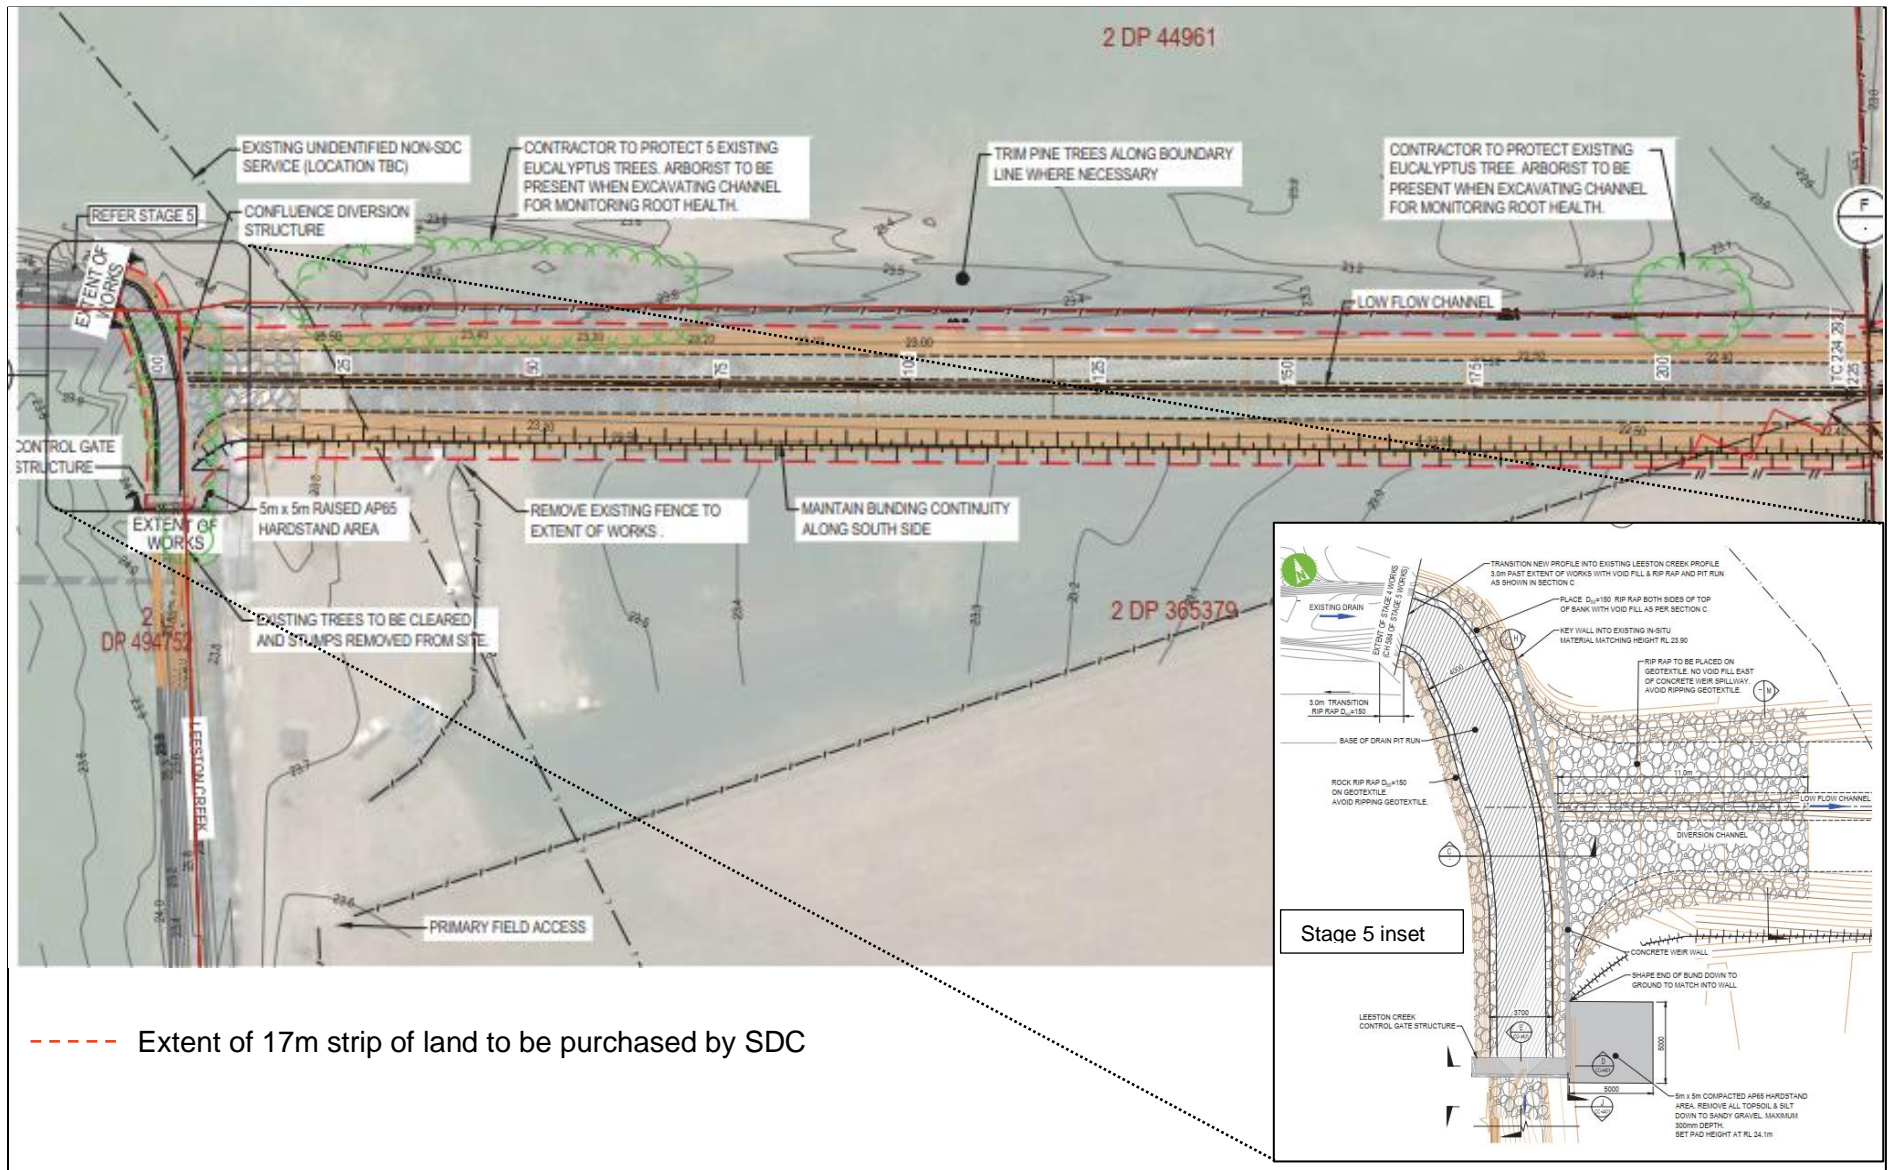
Excerpts from Aurecon design drawings showing the 17m strip of land to be purchased, proposed bypass design within 60 Leeston Dunsandel Road and construction details
